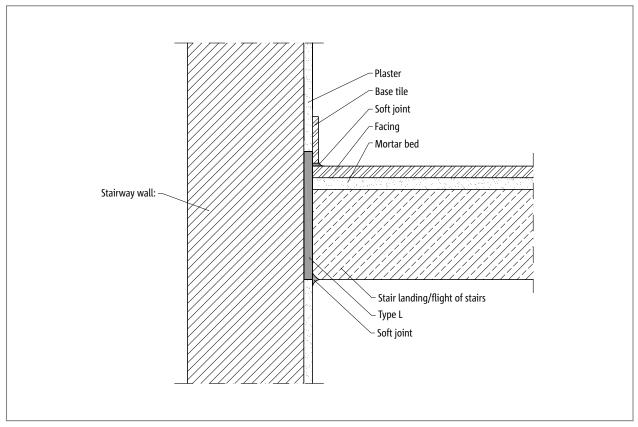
Schöck Tronsole® type L: Installation cross-section in-situ concrete stairs
